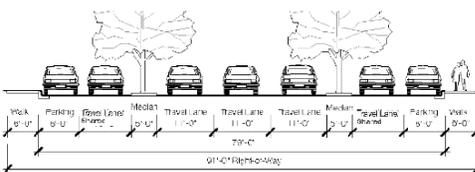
(10d). Sample One-Way Boulevard - 4th Street.
